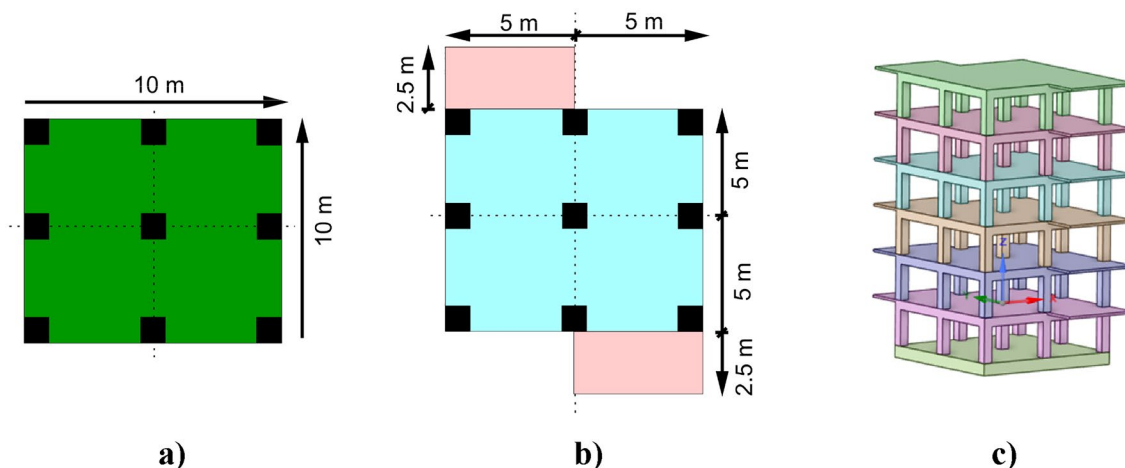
Views for structure: (a) mat foundation, (b) story, (c) building.
